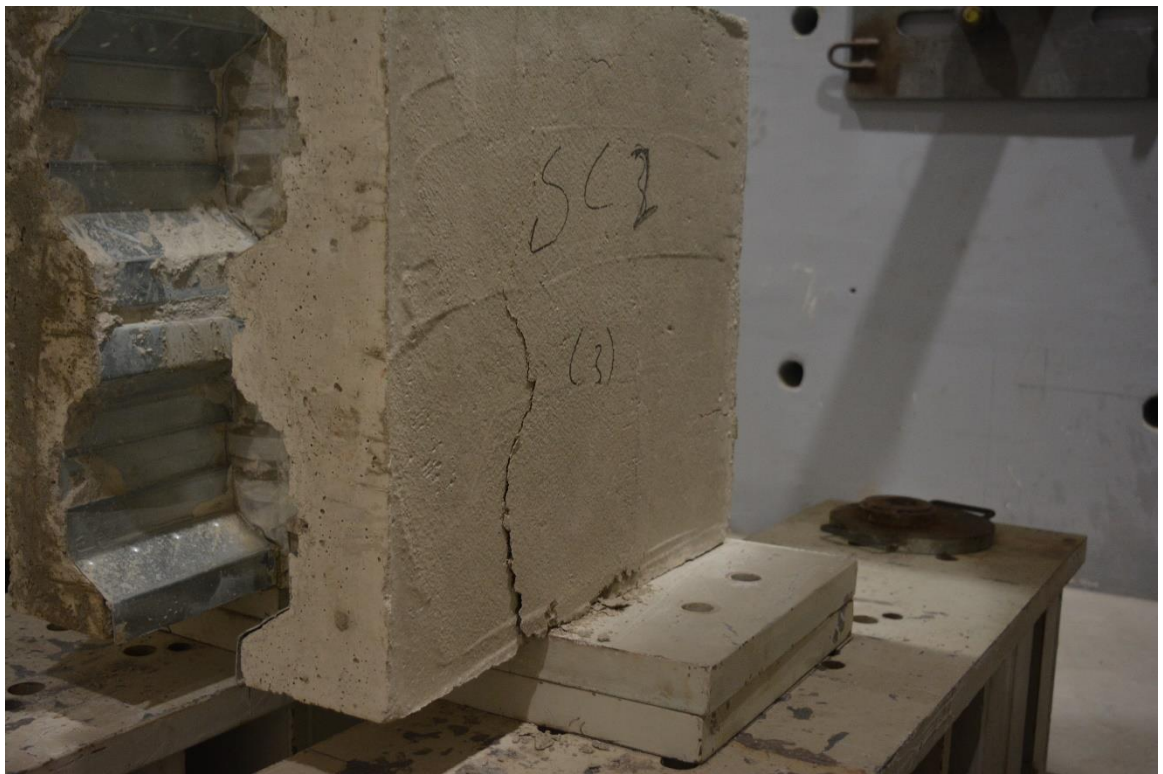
Longitudinal shear of the slab specimen series of SC-SR.
